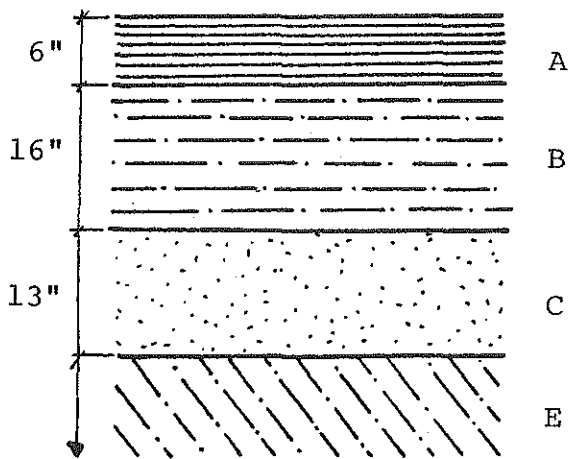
Pavement cross-sections at the test sites, Lower Peninsula.
